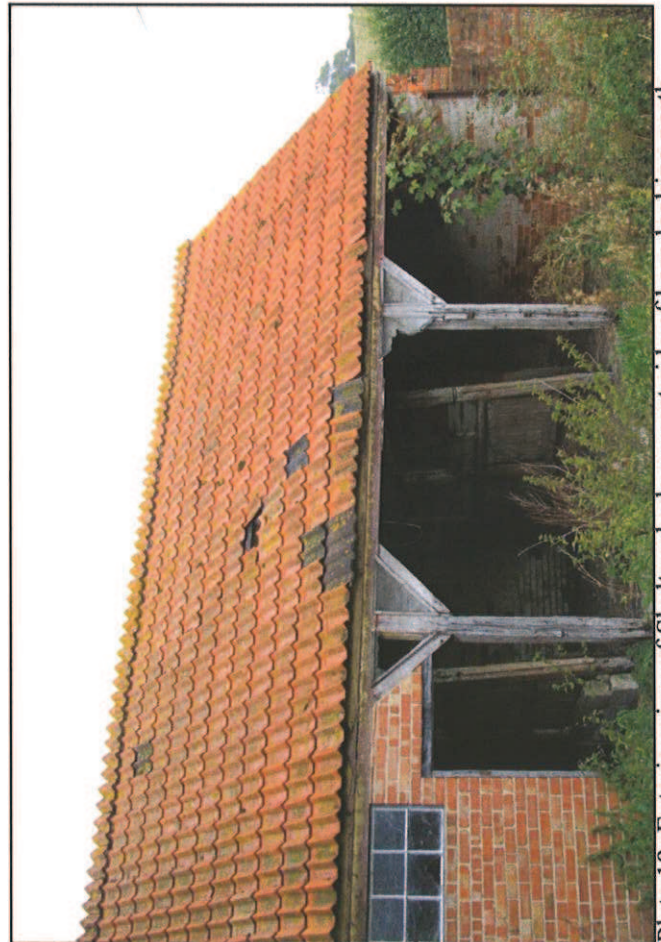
Exterior view of Shelter sheds on east side of barn looking north (Block C)
